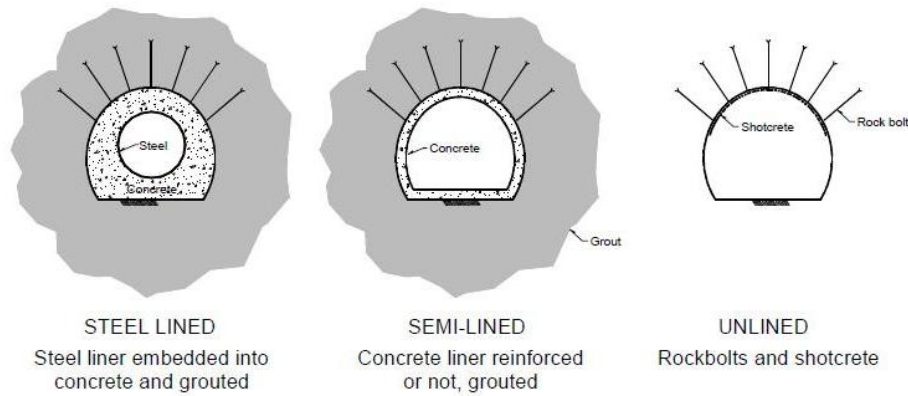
Tunnel lining reinforcement sections (Rancourt *et al.*, 2007)
